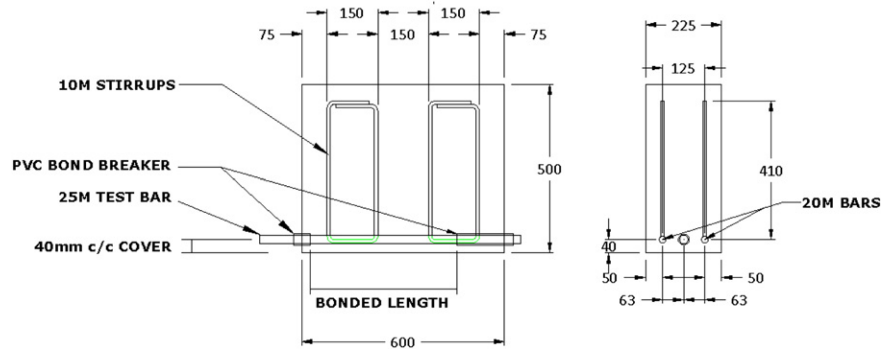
Beam-end specimen dimensions and reinforcement details.
